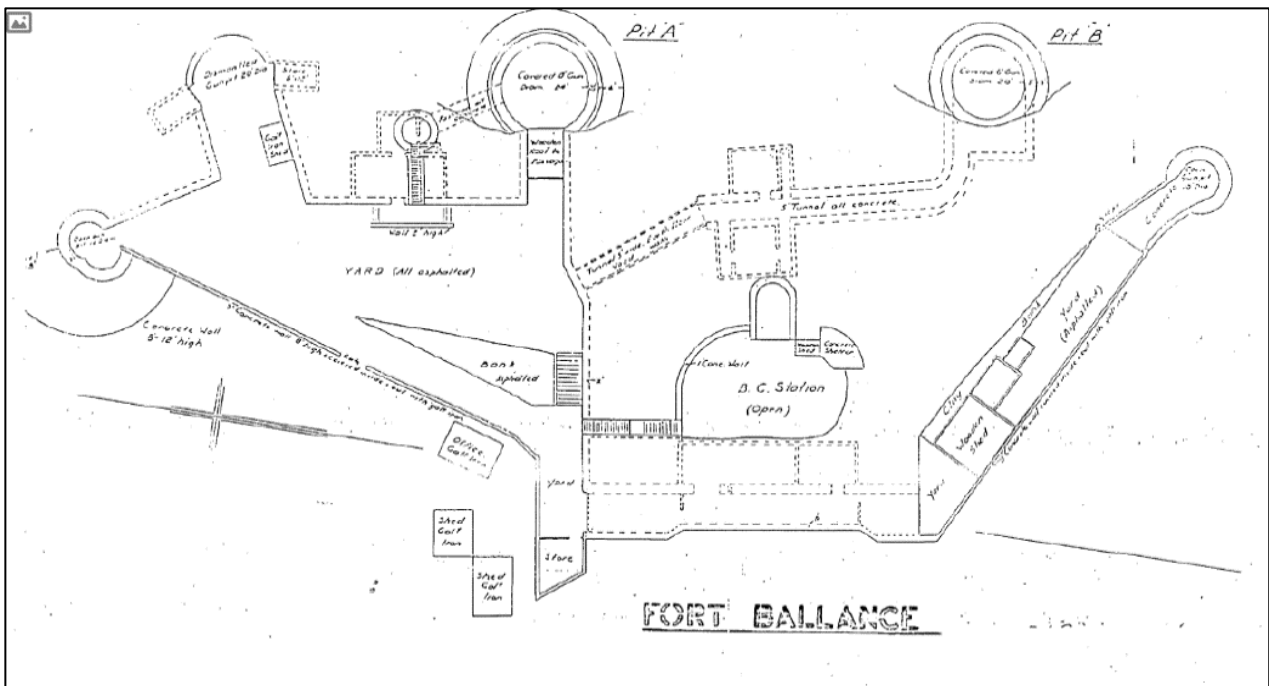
Fort Ballance site plan (A Dodd, 2013a).
